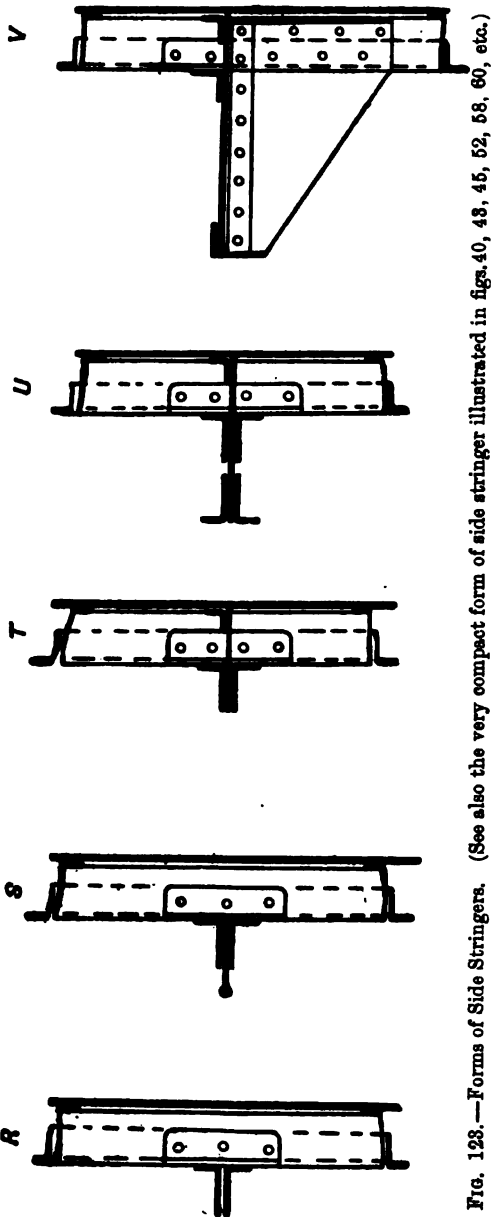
Forms of Side Stringers. (See also the very compact form of side stringer illustrated in figs. 40, 43, 45, 52, 58, 60, etc.)
